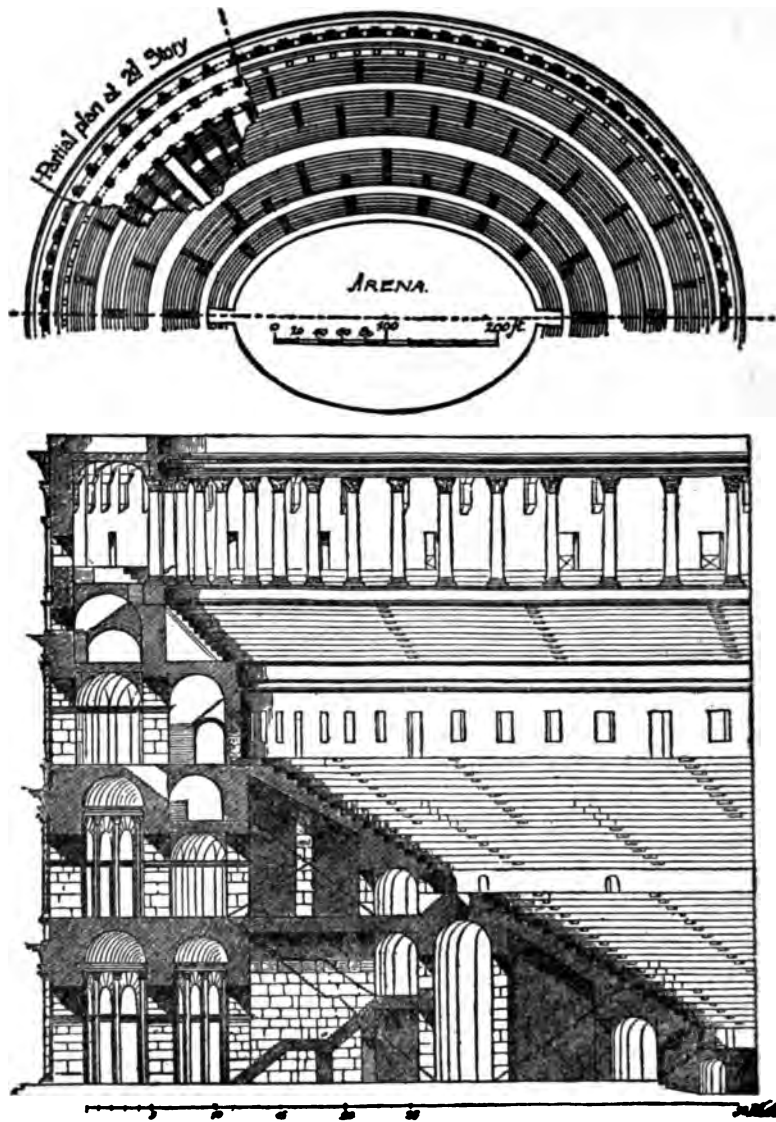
PLAN AND SECTION OF THE COLOSSEUM
